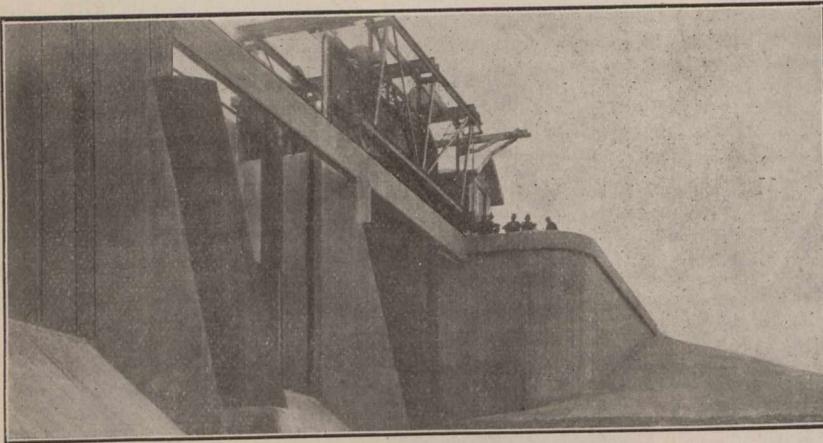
Massive Abutment and Pier Construction, Bassano Dam.
